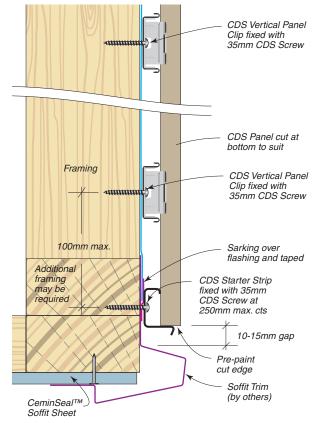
Soffit Detail - With Soffit Trim - Elevation
